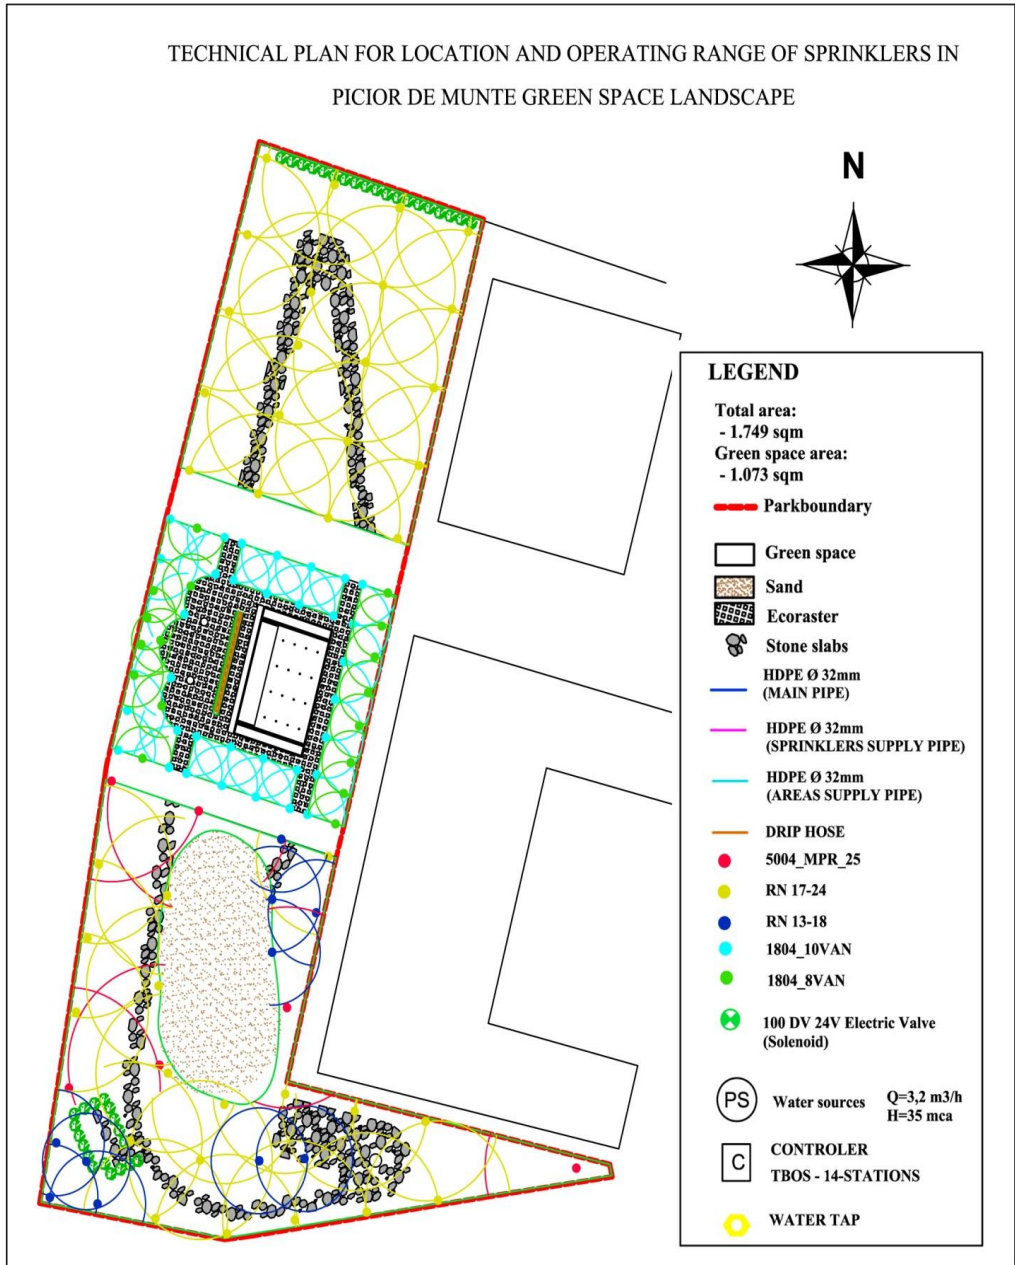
Technical plan for location and operating range of sprinklers in Picior de Munte green space landscape
